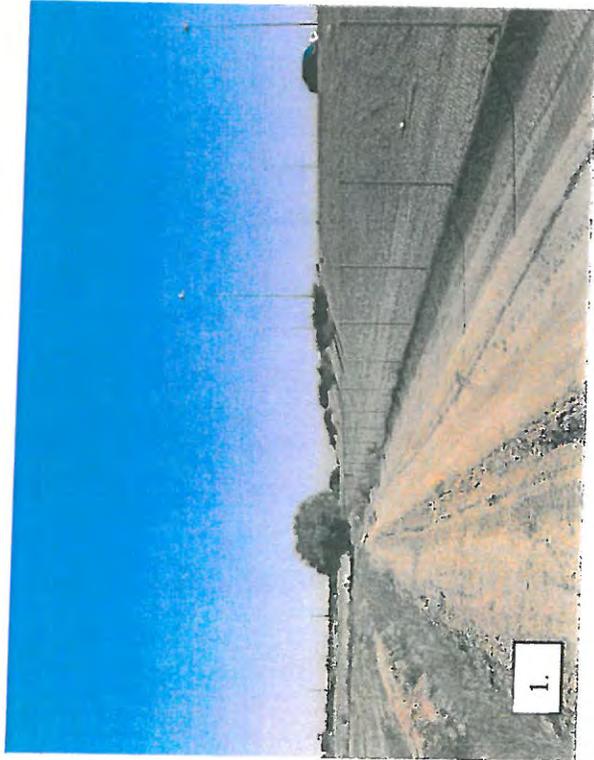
CONTEXT PLAN AND PHOTOGRAPHS (LOCATION E- PHOTOS 1-4)
